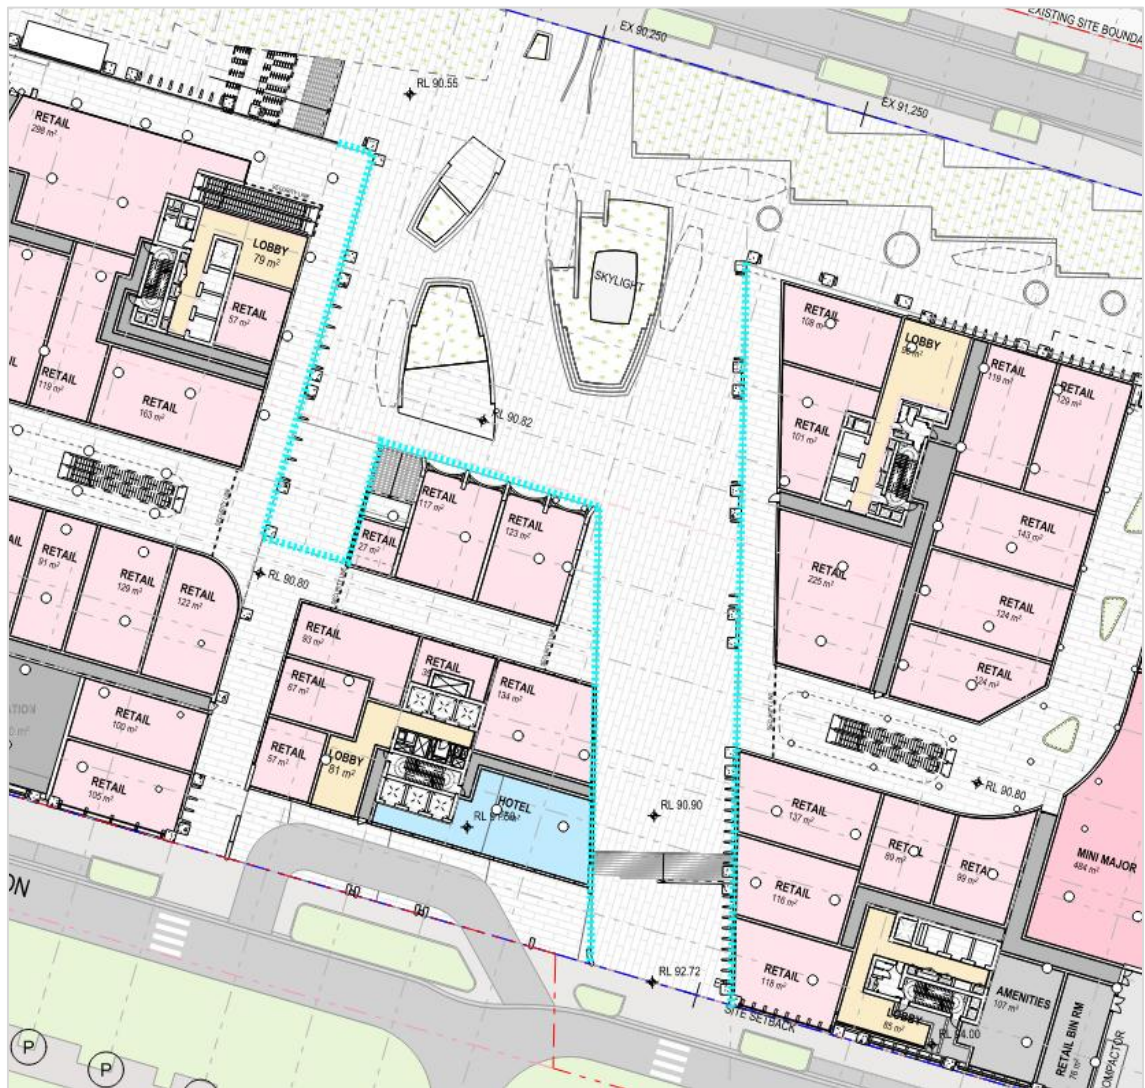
Ground Level Plaza area is roof as open space and allows retail tenancies to exit onto the plaza which is connected to the public road to the north and south. Aqua line indicates where roof as open space is achieved.
